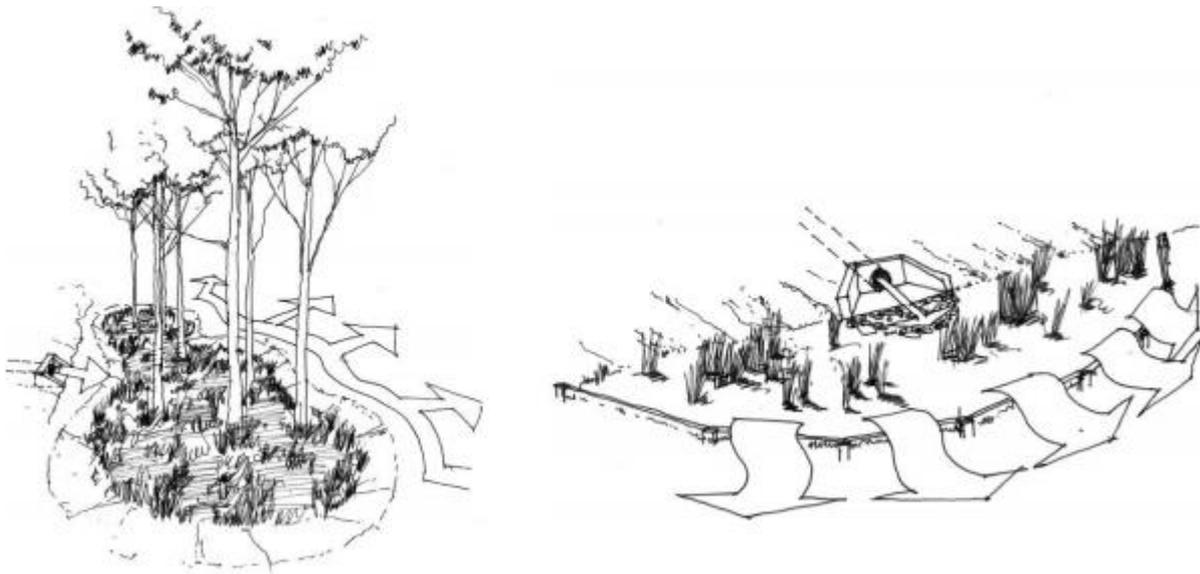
Stormwater Outlets to WSUD assets (left) or riparian area (right) (source: Water by Design 2014)
